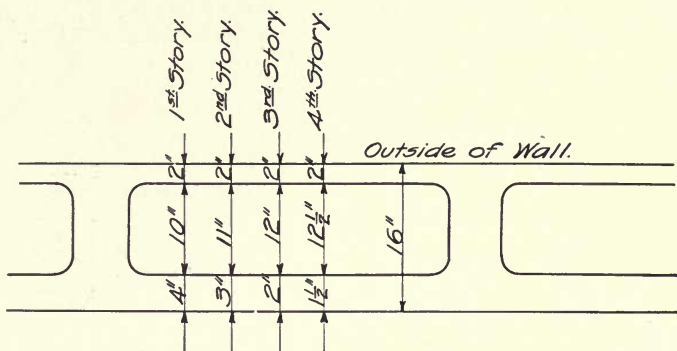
Typical Horizontal Section of Wall. (See p. 51.)
